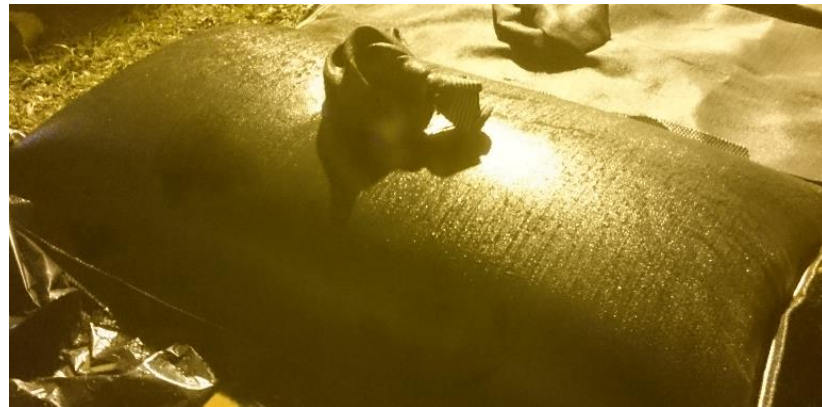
Close geotextile system, geotextile tube (Authors, 2017).
